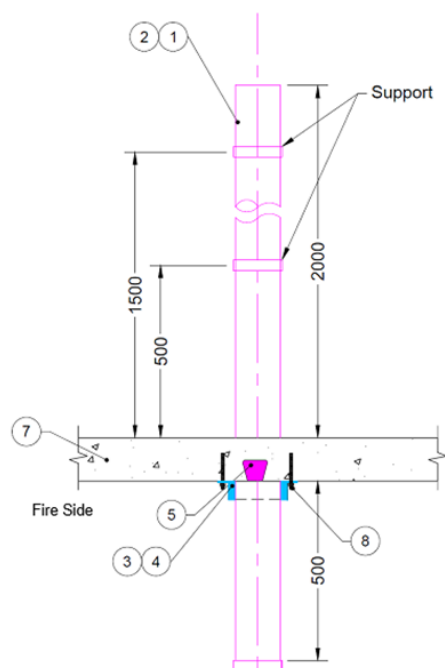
Plastic pipes with PROMASEAL® FC collars in floors with Bondek® steel deck
